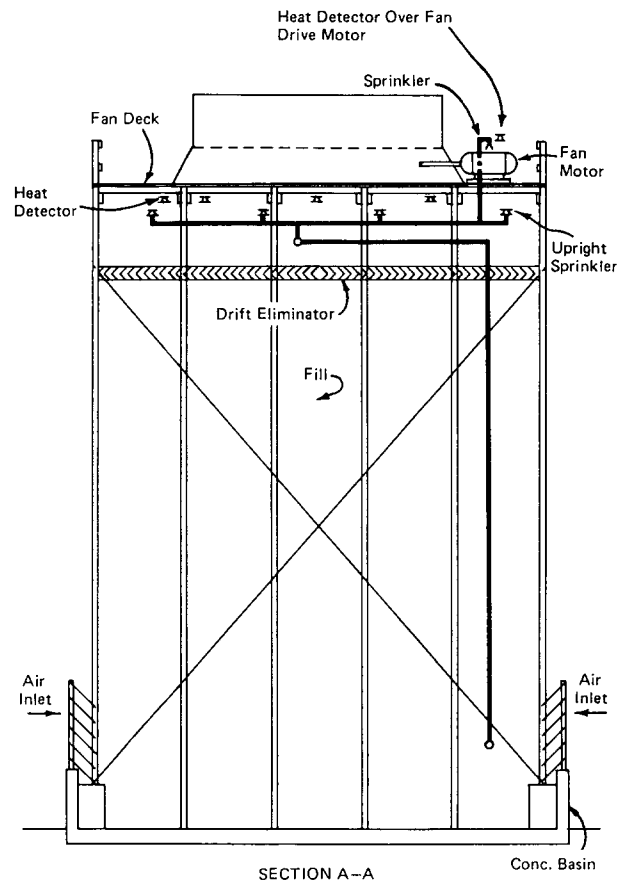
(d) Typical deluge or dry-pipe fire protection arrangement for counterflow towers.
